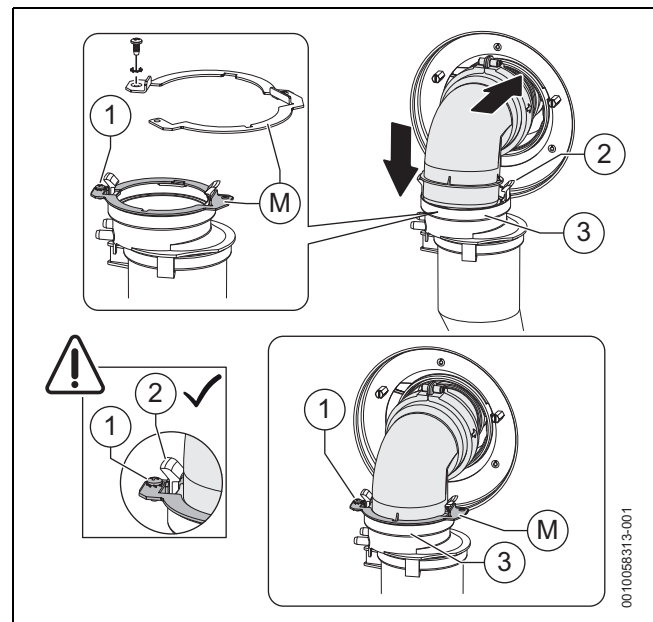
Adaptor assembly fitting to appliance exhaust outlet
